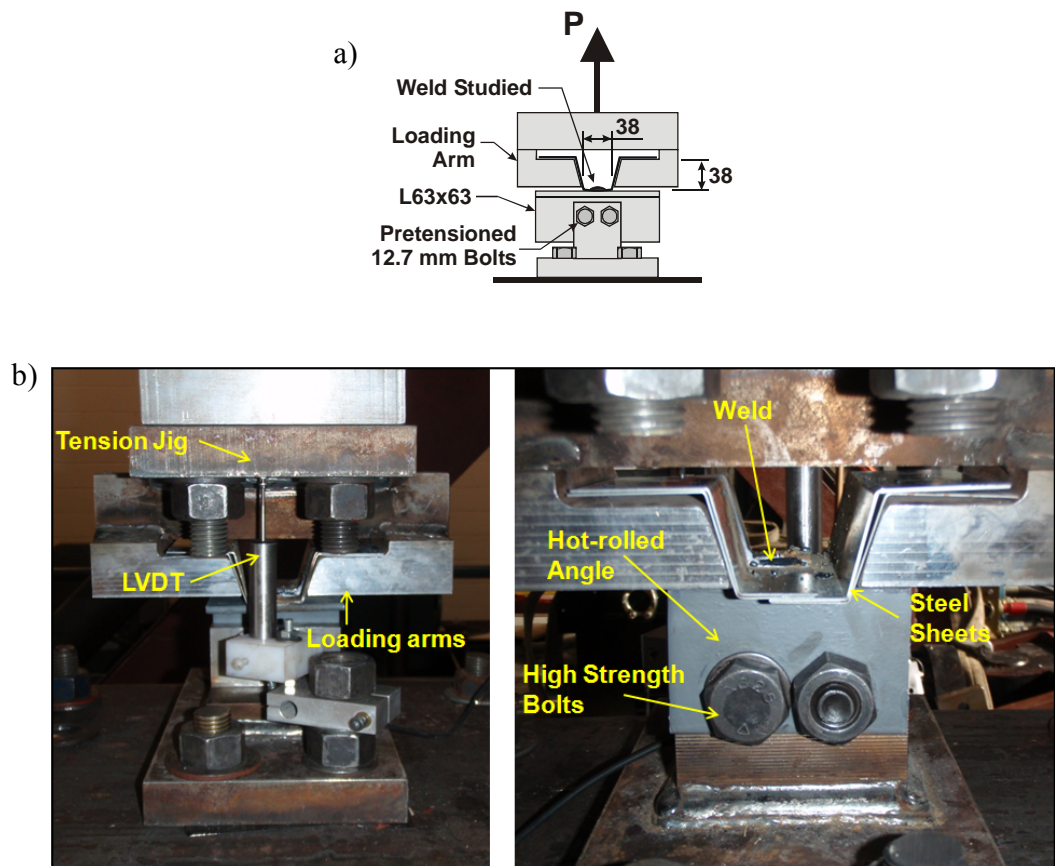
Tension test set-up: a) Schematic elevation view; b) Photos
